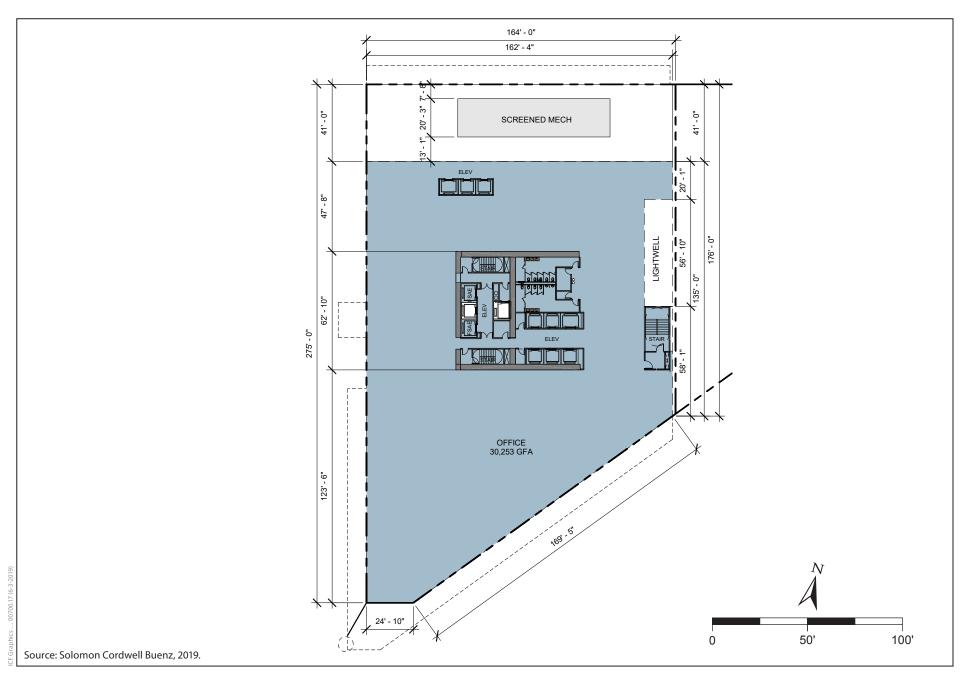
30 Van Ness Avenue Project – Proposed Level 9–12 Plan
